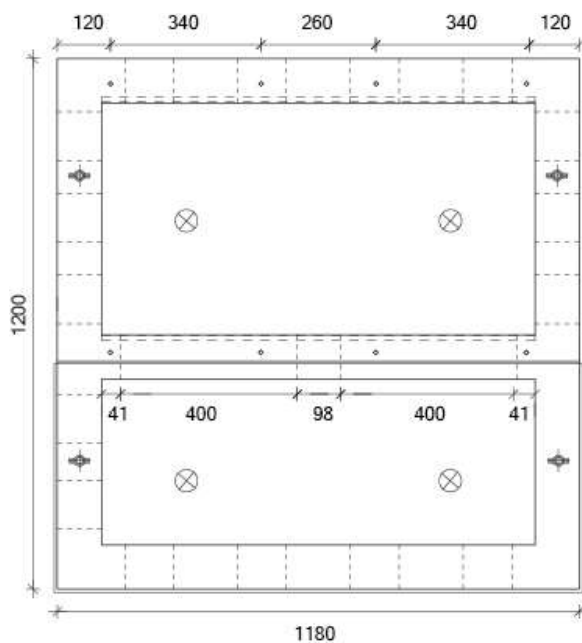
Indicative drawing for triple cabinet's concrete foundation, top view (mm)
